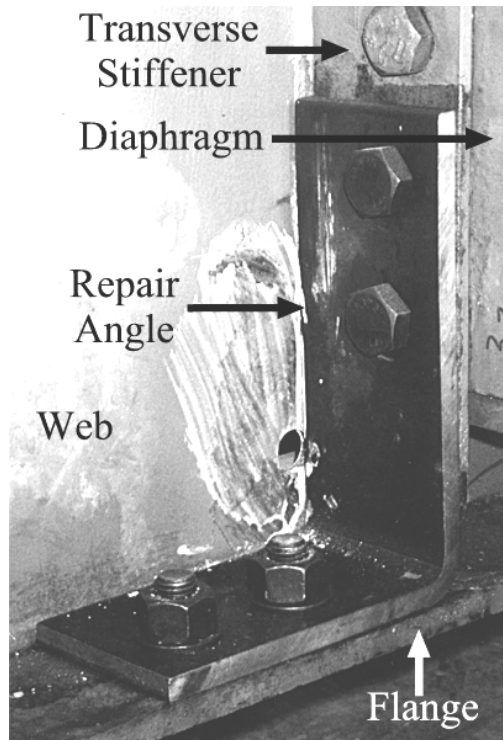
Fatigue Crack on West Face of Joint 13, Specimen 4
